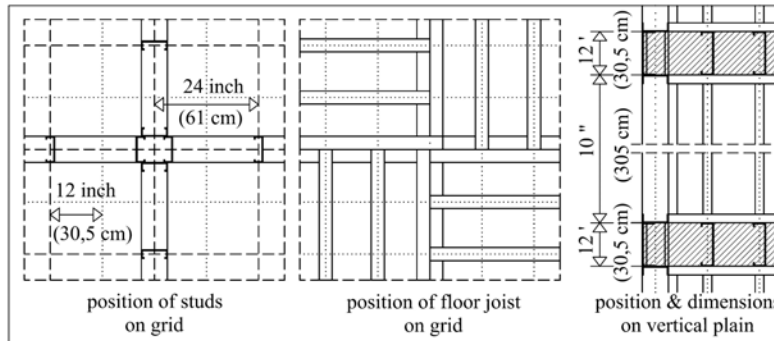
Position of building elements on horizontal grid and dimensional coordination on vertical plain
